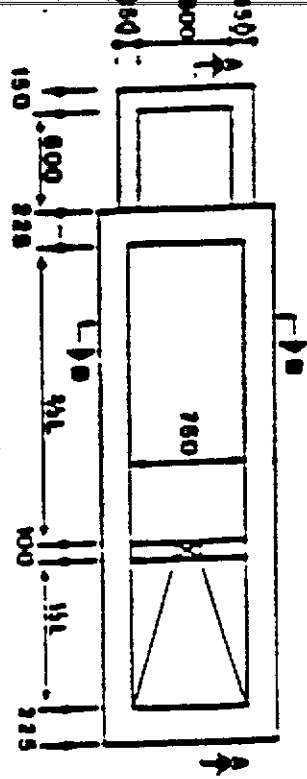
DETAILS OF REINFORCED CONCRETE ROOF SLABS
